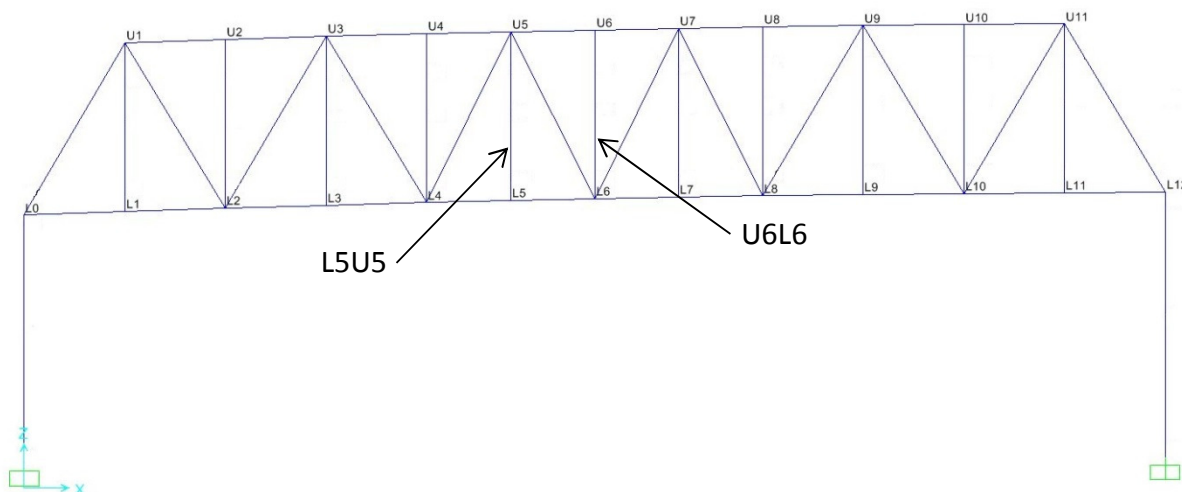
Little Mystic Elevation - Instrumented Verticals
